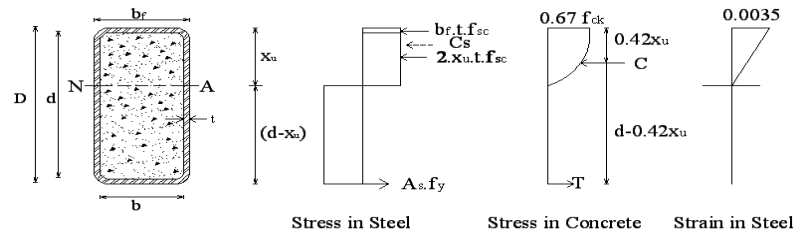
Stress-Strain distribution in concrete-filled hollow steel section at M_u
